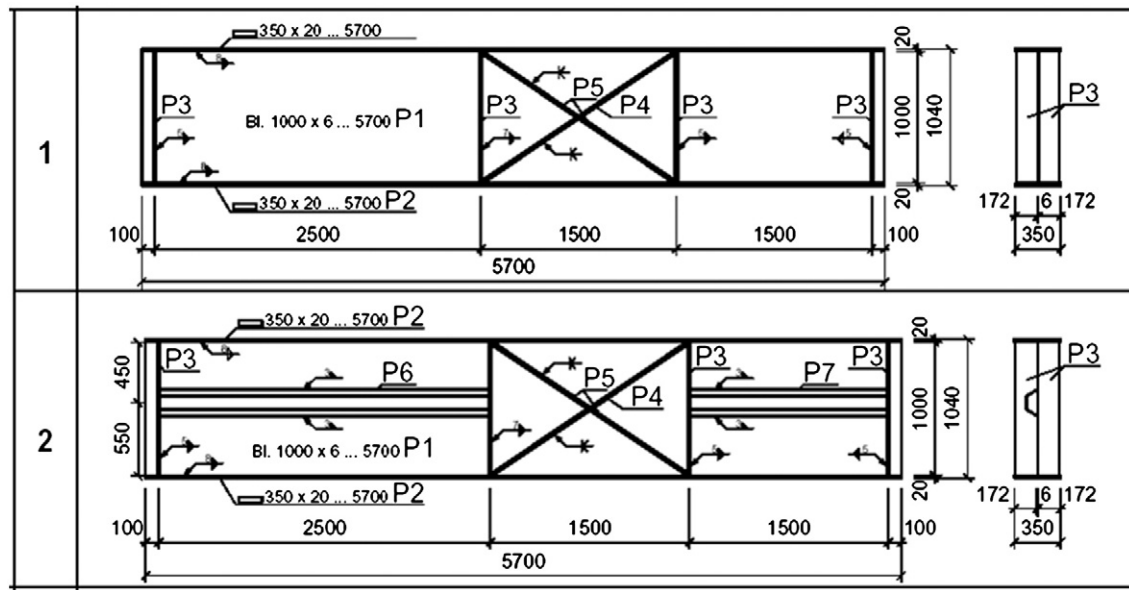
Elevation views of: the unstiffened plated beam (case 1) and the stiffened beam with a longitudinal closed stiffener (case 2). [4].
